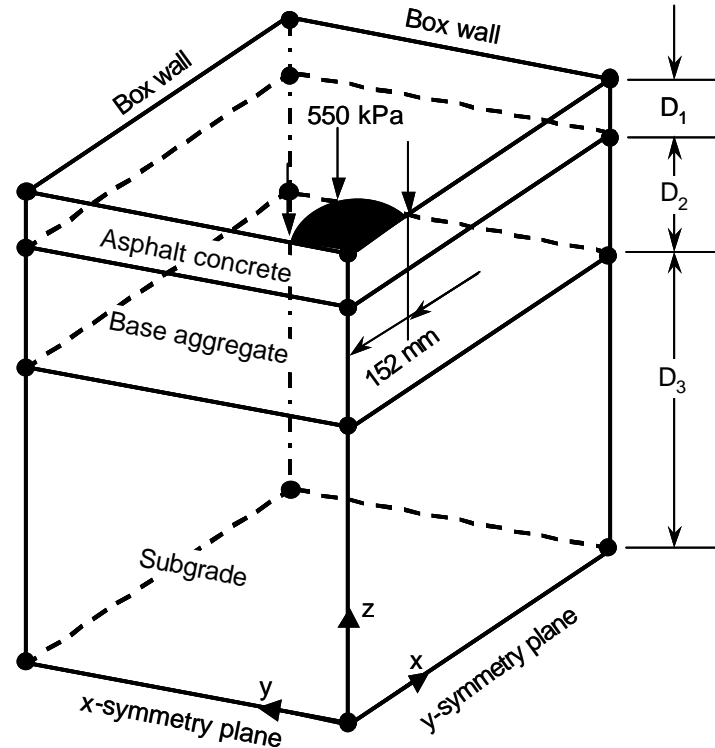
Finite element model of unreinforced pavement test sections.
